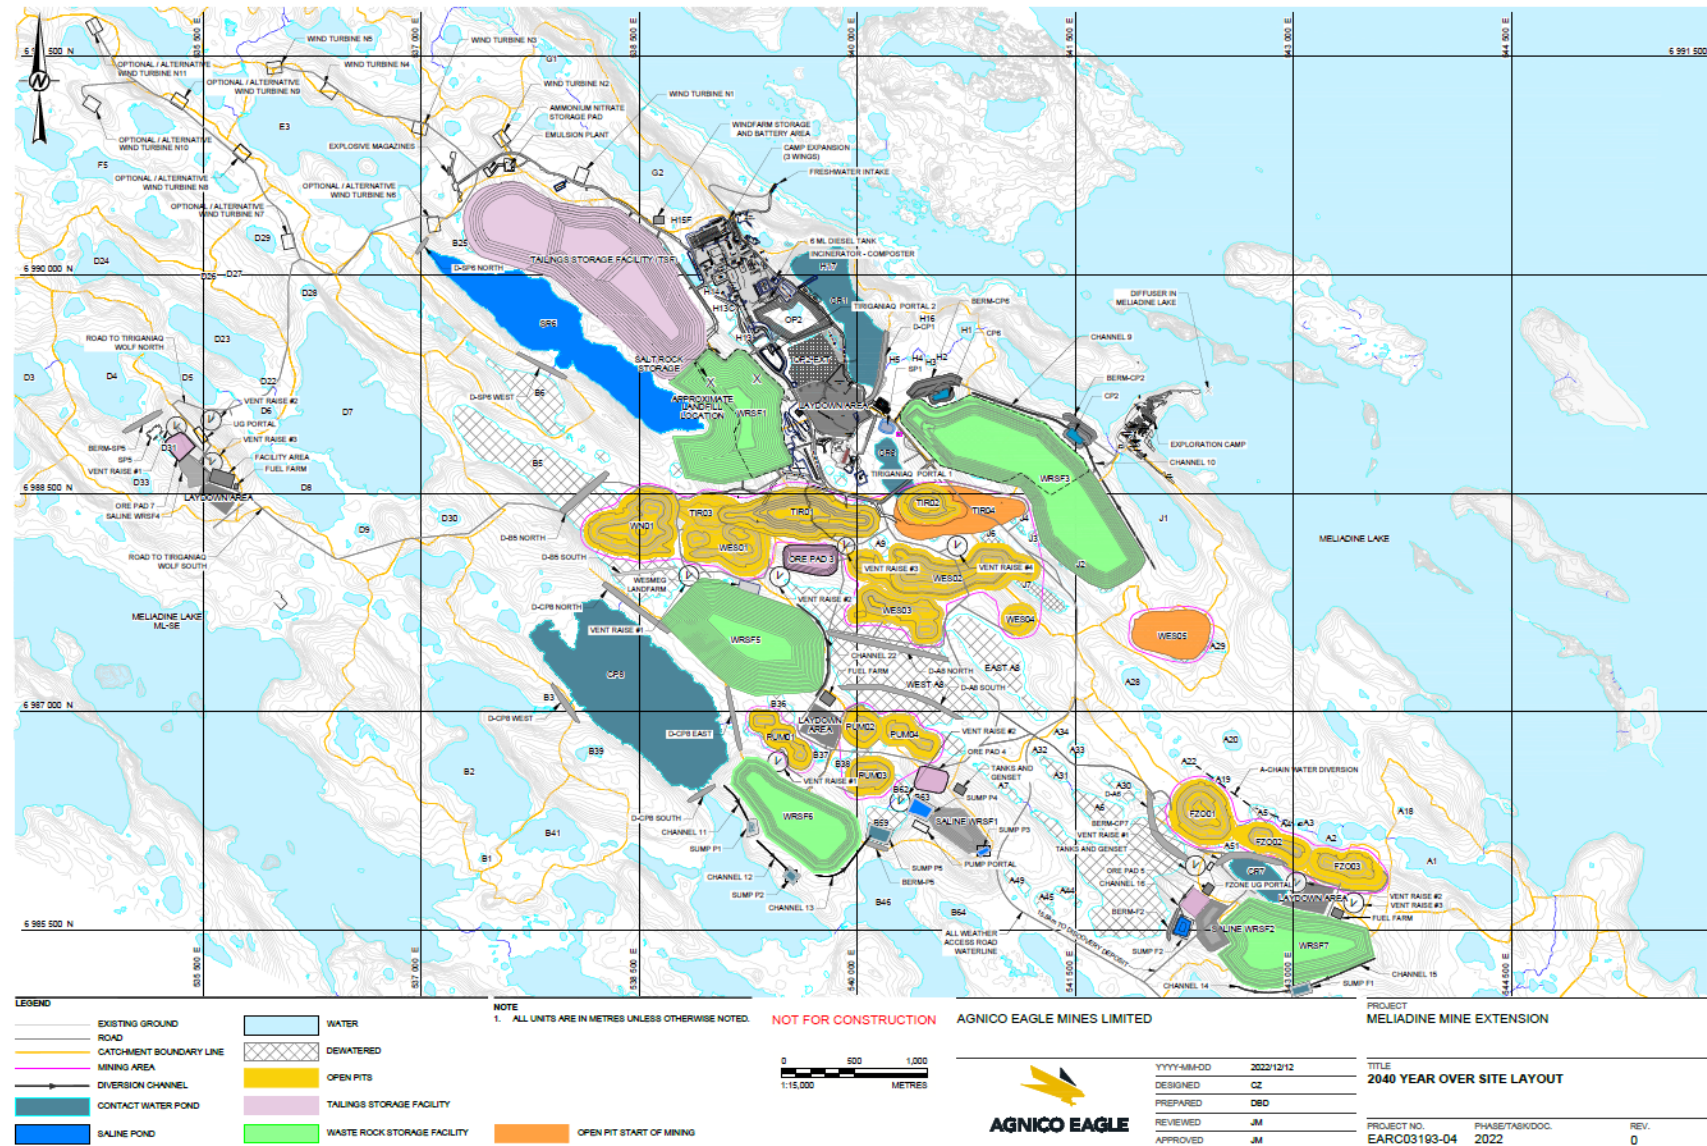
Mine Site Layout –Discovery Deposit (2040)
